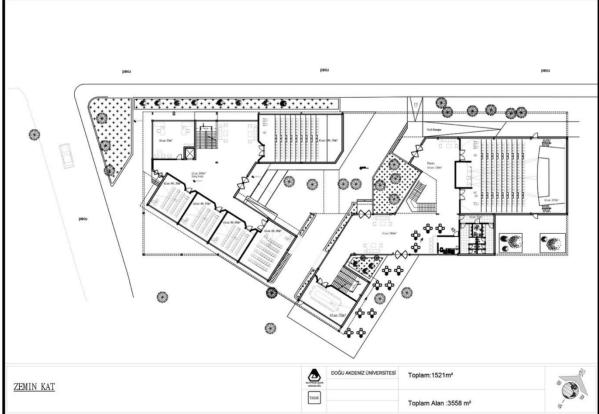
Lecture halls and seminar spaces Plan of the Green Building
